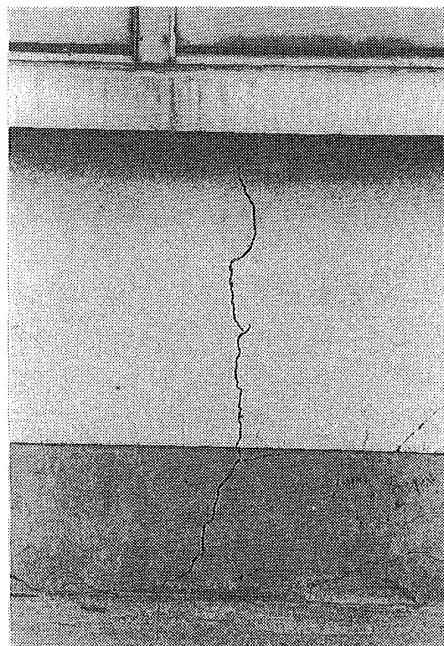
Cracking formed on the external wall of a building—Type C (column span)
